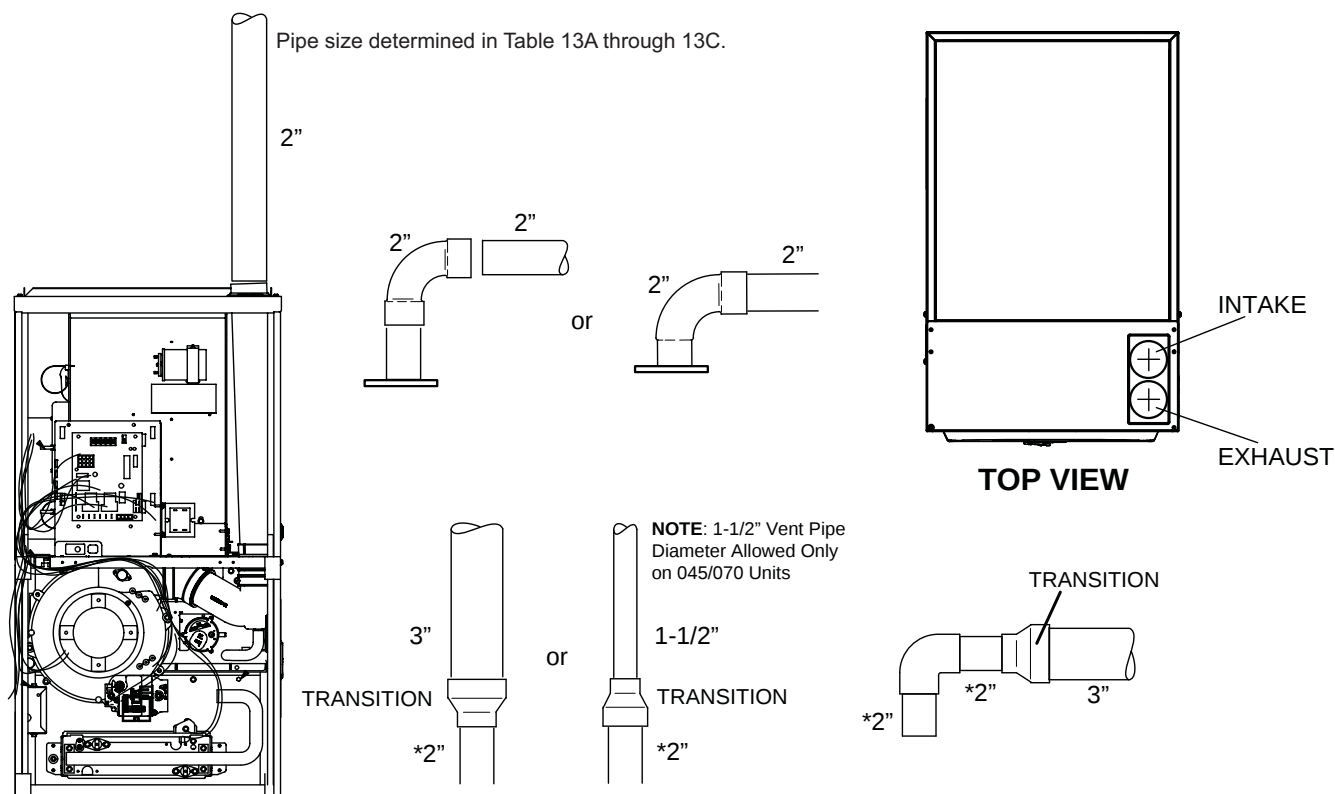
Typical Intake Pipe Connections (Direct Vent Applications)
